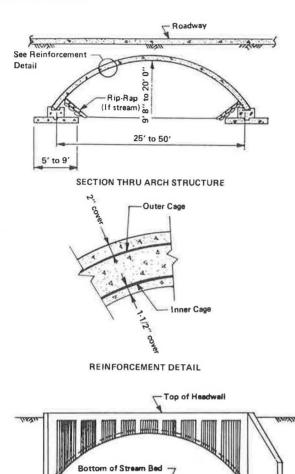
Typical geometric details of precast concrete pipe-arch structures.
